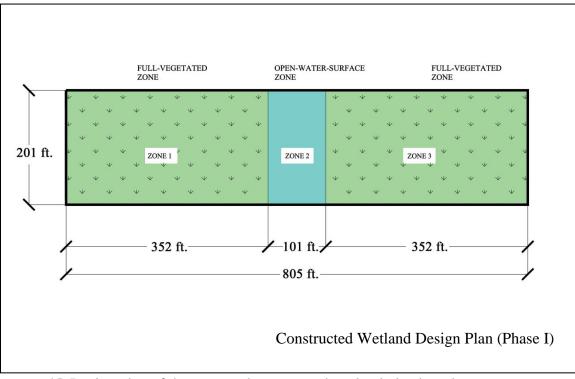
Design plan of the proposed constructed wetland plan based on current sewage volume.
